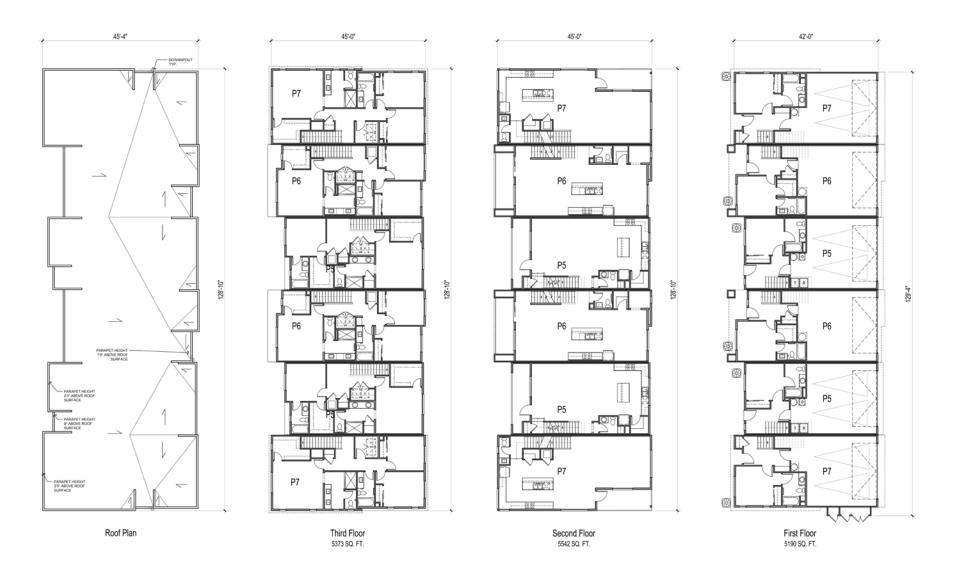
Conceptual Architecture - 6-Plex Building Floor Plan "F"
